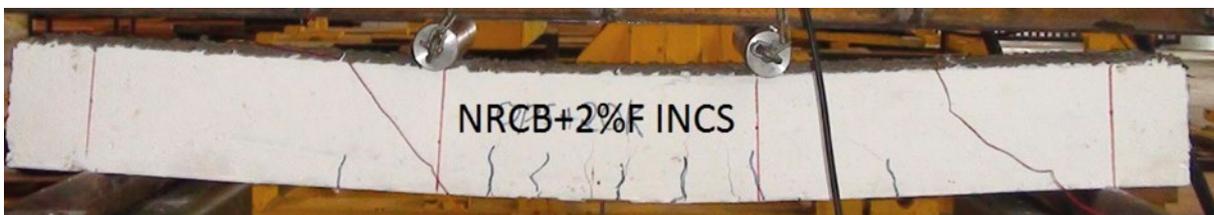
RC beam reduced shear reinforcement with 20kg/m<sup>3</sup>
